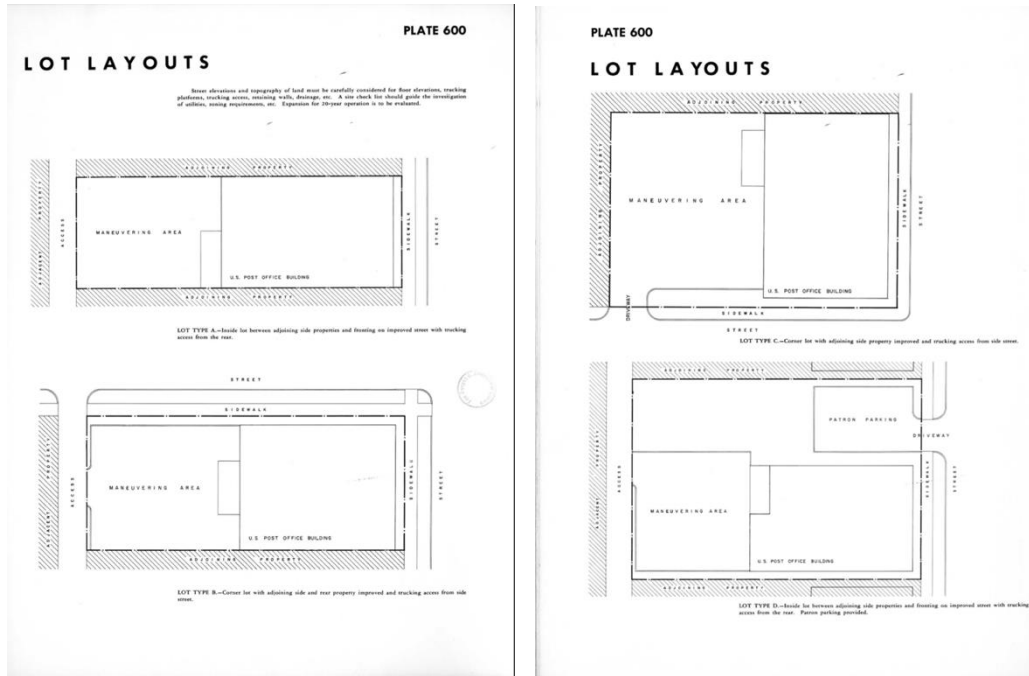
Lot layouts for Thousand Series facilities in Building Design Guidelines (Eisenhower Presidential Library, 1959).
